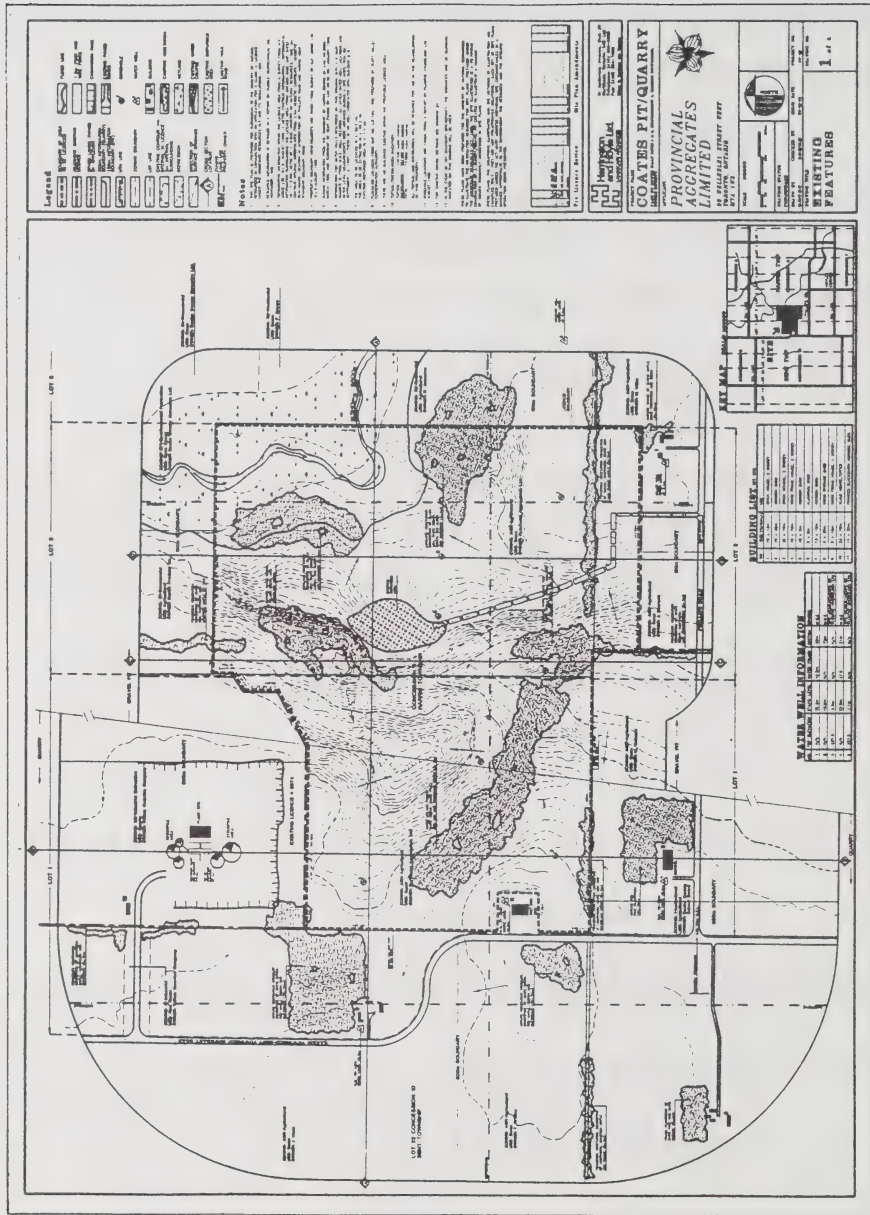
Operation Plan - Sample Site Plans, Aggregate Resources Act
